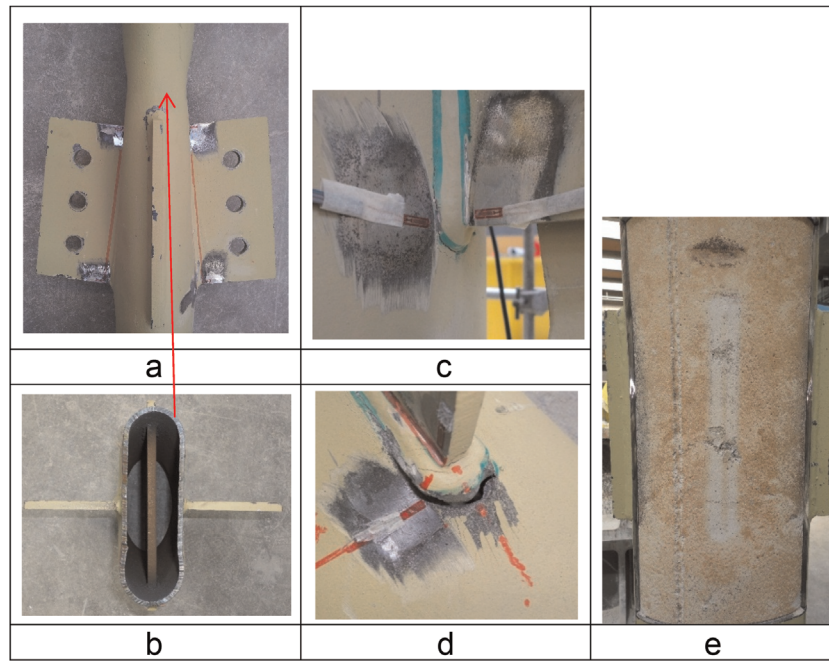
Failure of Type-E connections: (a) Joint-E; (b) top section of Joint-E column; (c) initial cracks of Joint-EC; (d) fracture failure of Joint-EC and (e) core concrete of Joint-EC.
